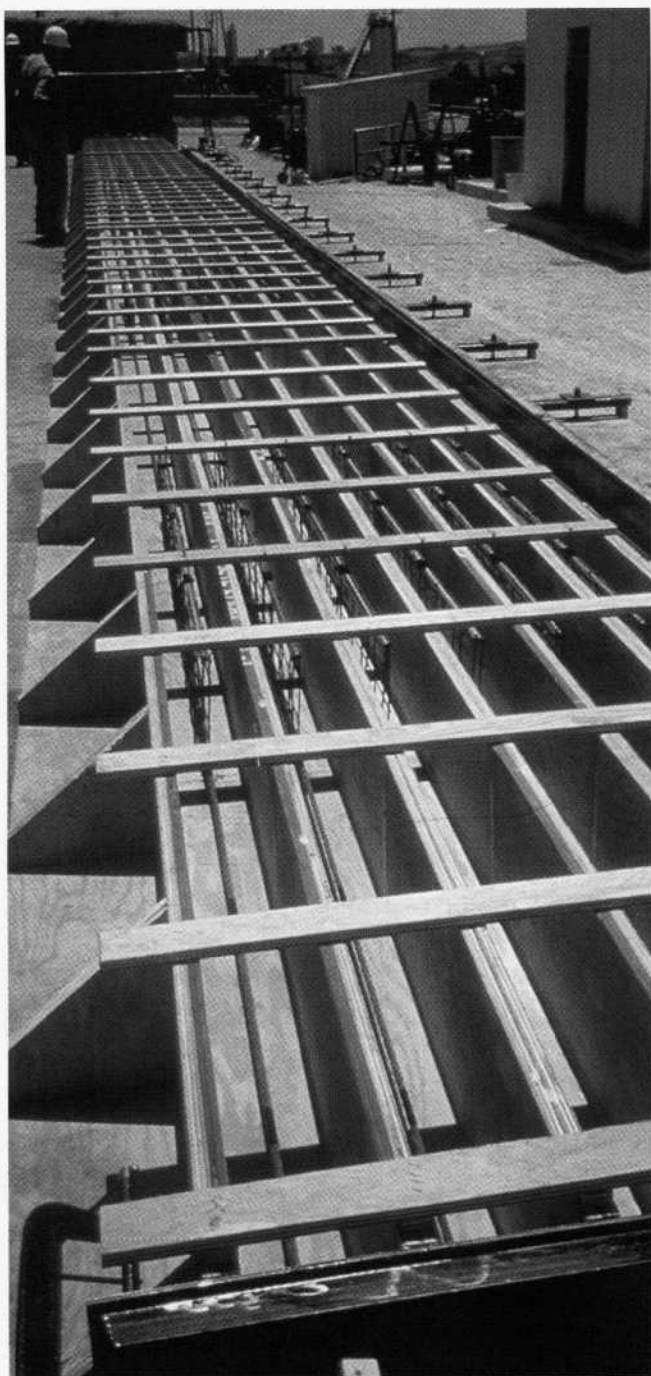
Wood form, steel end plate, strand and web mesh in place, ready for concrete casting (May 17, 1996).
